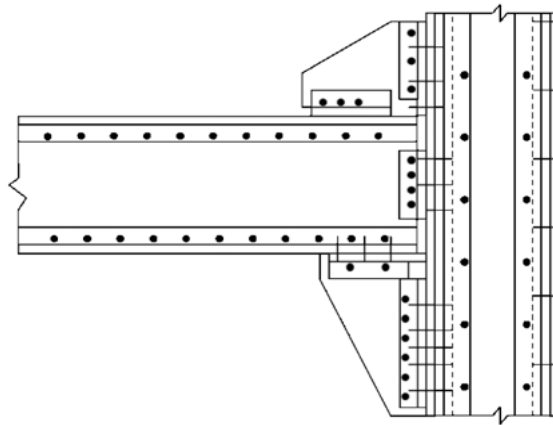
Typical early moment connection for steel frame buildings constructed prior to the 1950's, consisting of heavy triangular gusset plates, angles, and rivets connecting built-up columns and beams.
